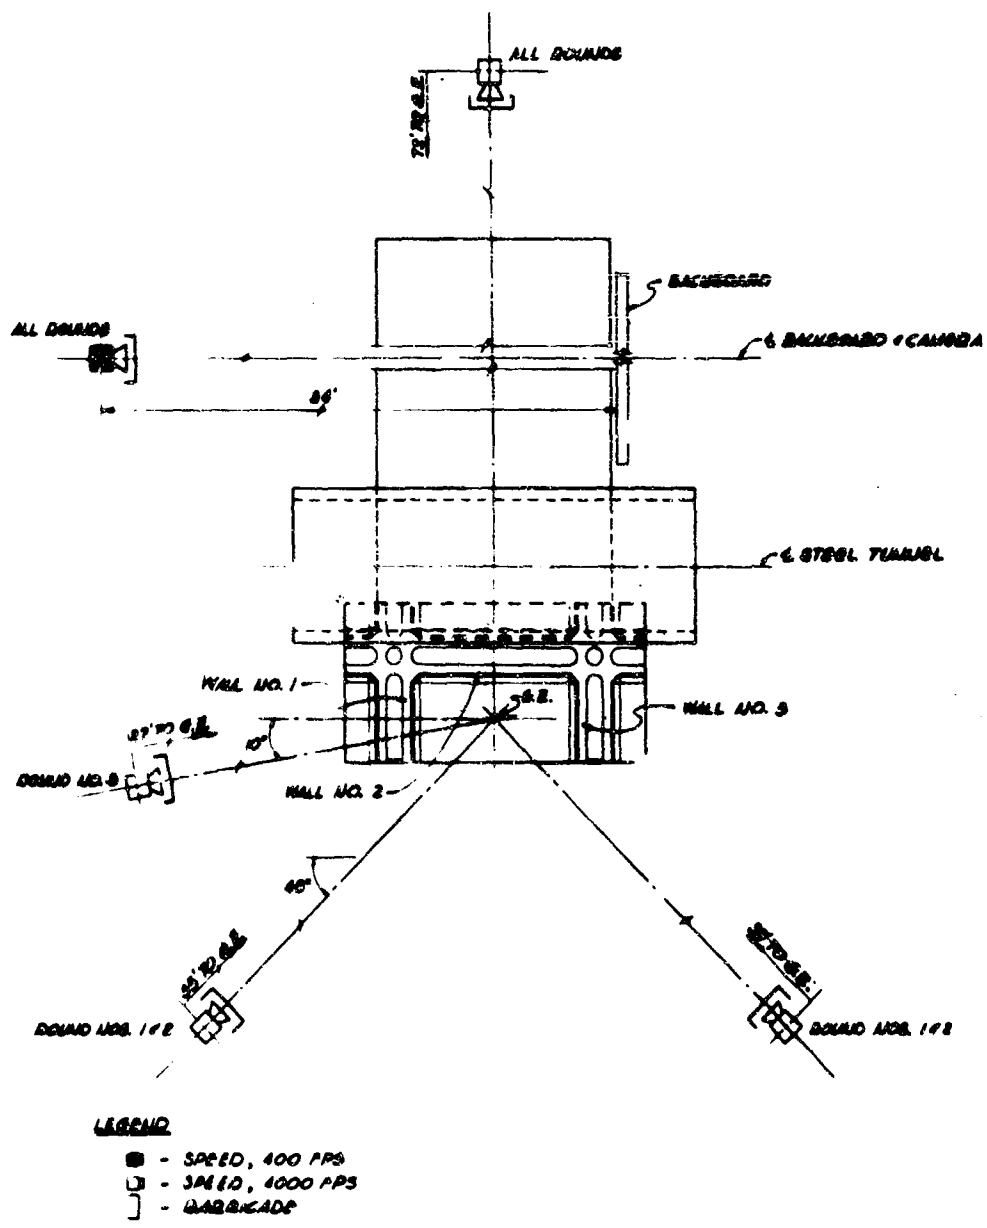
CAMERA LAYOUT (One-Tenth Scale Structure)
